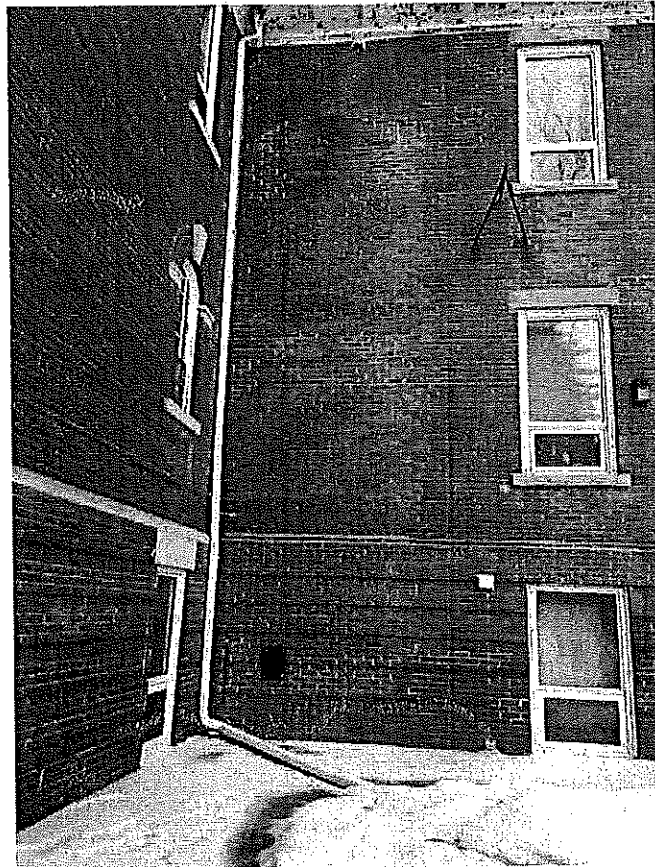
Join of 1924 addition with 1914 building – water staining on masonry from roof area above
